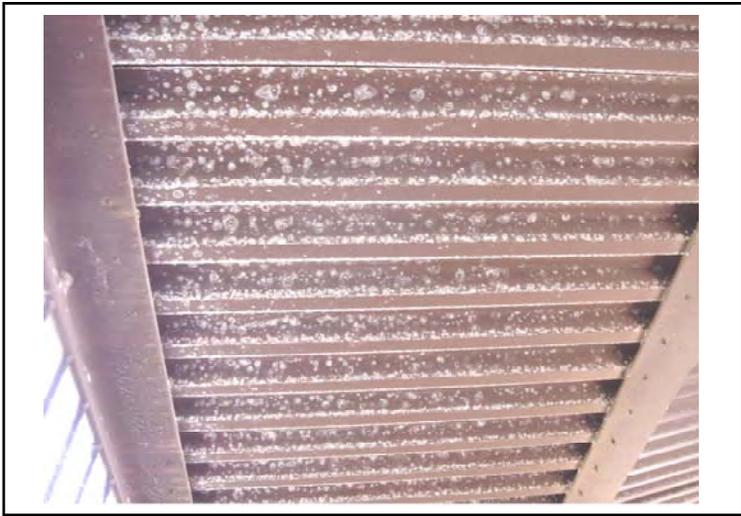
Underside of roof at joint between NE and SE movable stands.
